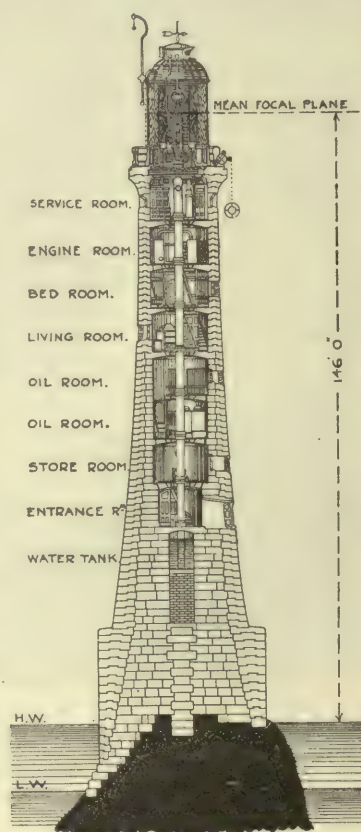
BISHOP ROCK LIGHTHOUSE: IMPROVED TOWER (Douglass, 1887).
